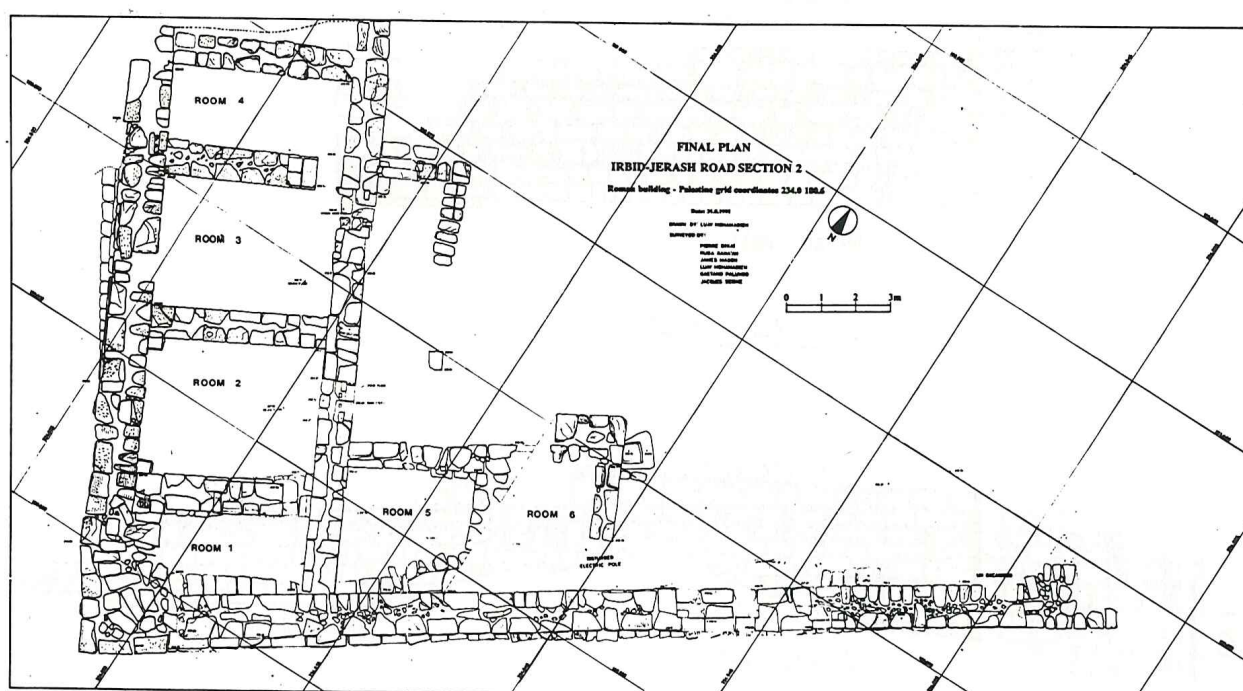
Final top plan of the Roman building at “Tell Fayṣal”. Drawing by Lo’ay Mohammadiyah.
